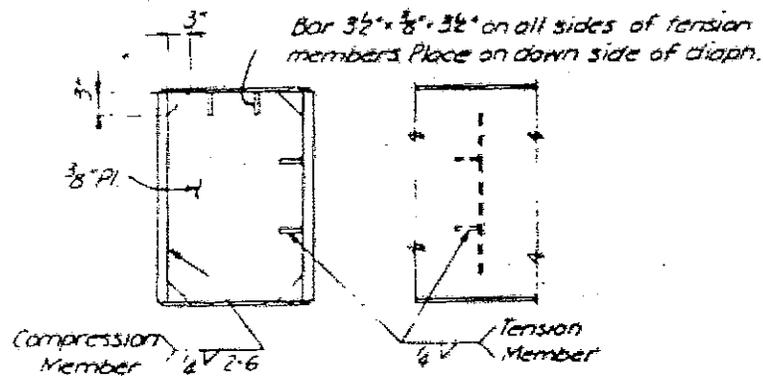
Welded Diaphragm Details in Main Truss Members from Original Contract Plans
